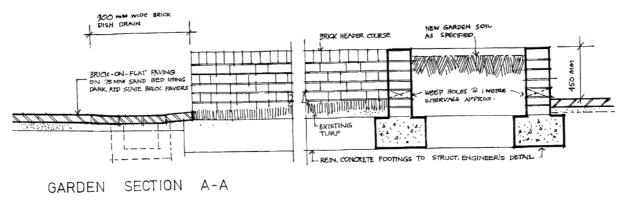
Section AA through Courtyard Garden showing footings to brick wall and garden beds. (Source: extract from Moss Vale Station Renovations, Working Drawings, Site & Landscaping Plans and Details, Dwg No. 1801342, prepared by David Sheedy, July 1986, for State Rail Authority of NSW)
